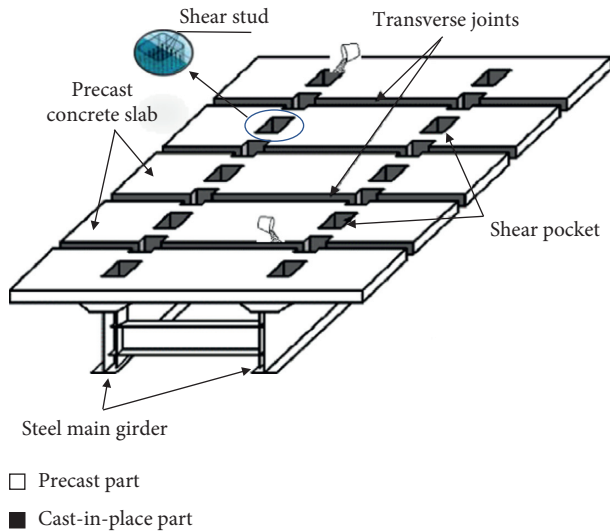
Twin I-girder composite bridge with the precast concrete slab.
